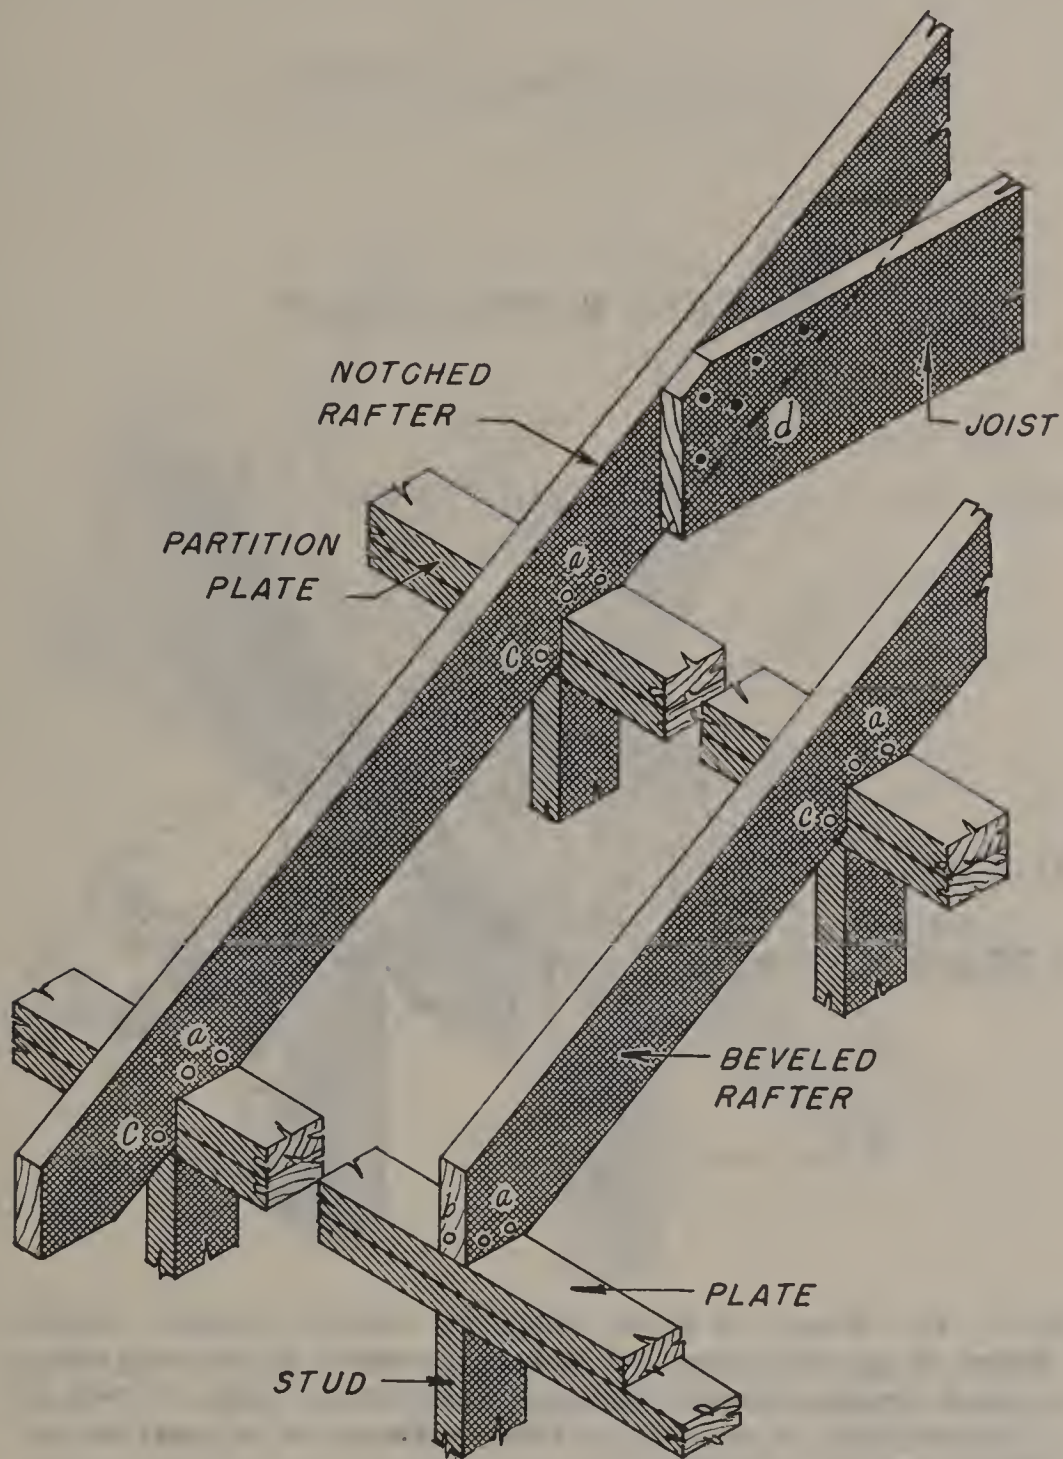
Rafters notched or beveled at wall plate and notched over partition plate with ceiling joist above partition plate. *a*, Rafters toenailed to upper face of plate with two tenpenny nails on each side of rafter. *b*, Beveled rafter toenailed to upper face of outside wall plate with one tenpenny nail at vertical cut. *c*, Notched rafters toenailed to outer edge of plates with one tenpenny nail on each side of rafter. *d*, Ceiling joist nailed to rafter with five tenpenny nails. Note: Resistance to uplift is deficient and may be augmented by the use of straps as in figures 49 and 50.
